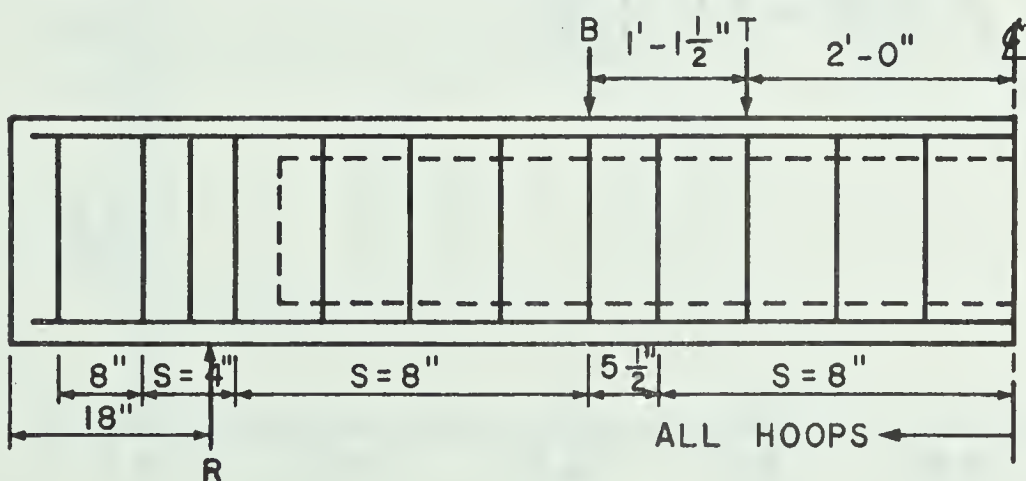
(C) REINFORCEMENT FOR BEAMS T1 AND T2
